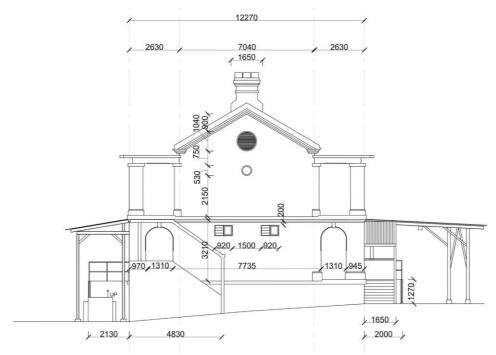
East façade, nowadays. (Source: Architectural Services Department)
